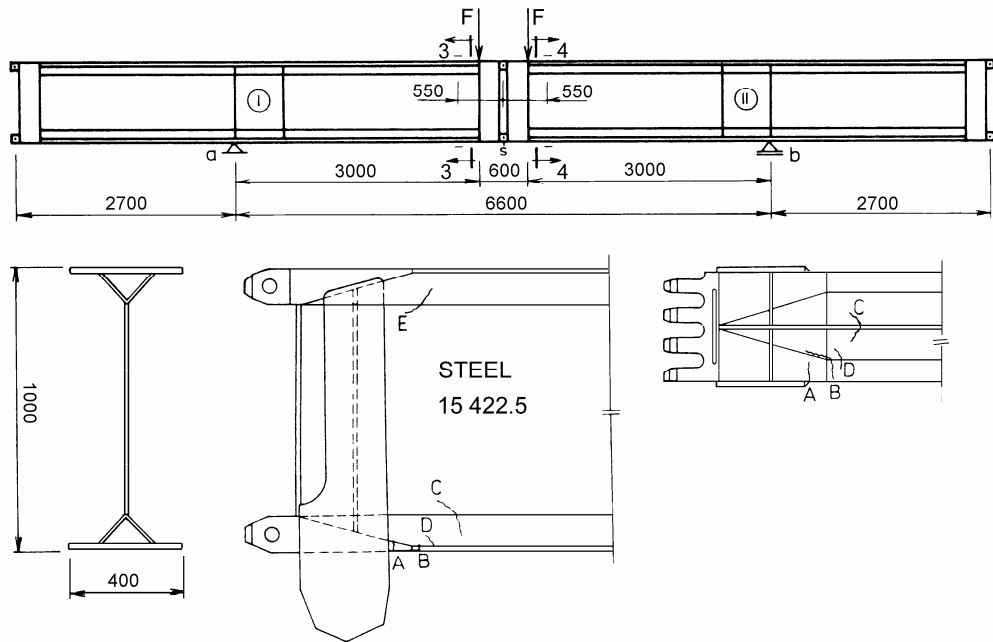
Static and geometric scheme of tested system 2. Position of fatigue cracks after test
